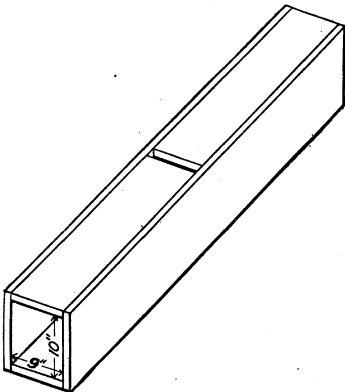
Chute for connecting yards. It can be closed by inserting a sliding door in a slot.
